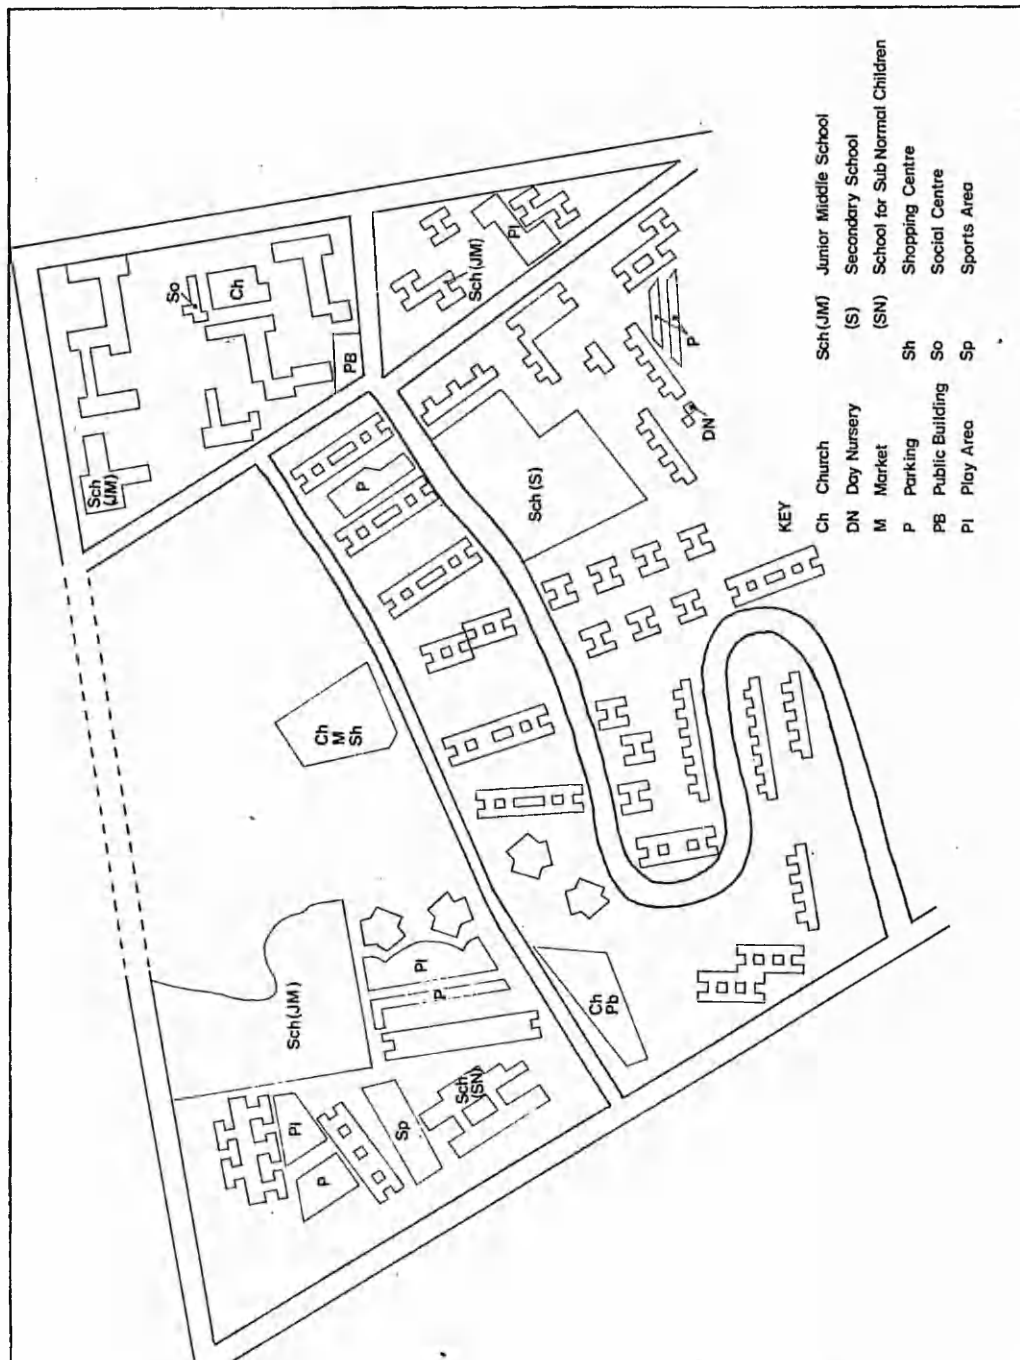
Building Layout. Road and Service Infrastructure and Collective Service Buildings included in the Seven Local Plan Modifications, approved 1964-71. (Compare with Figure 100).
